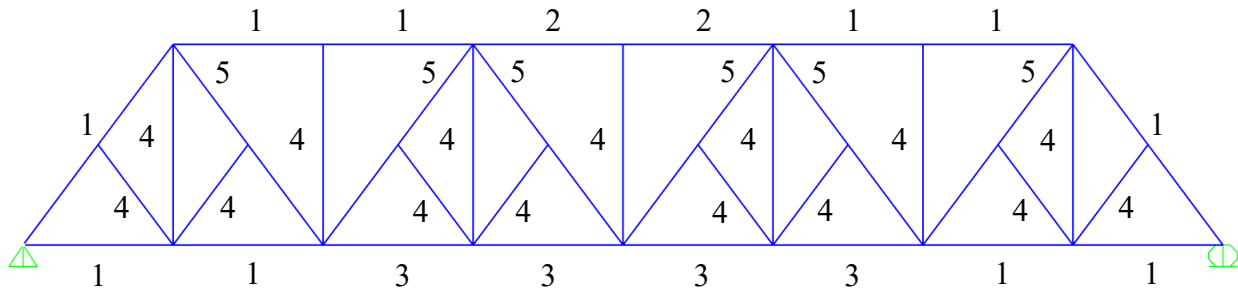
Steel through truss modeled in SAP2000 (CSI 2016) based off existing bridge in NS, Canada.
